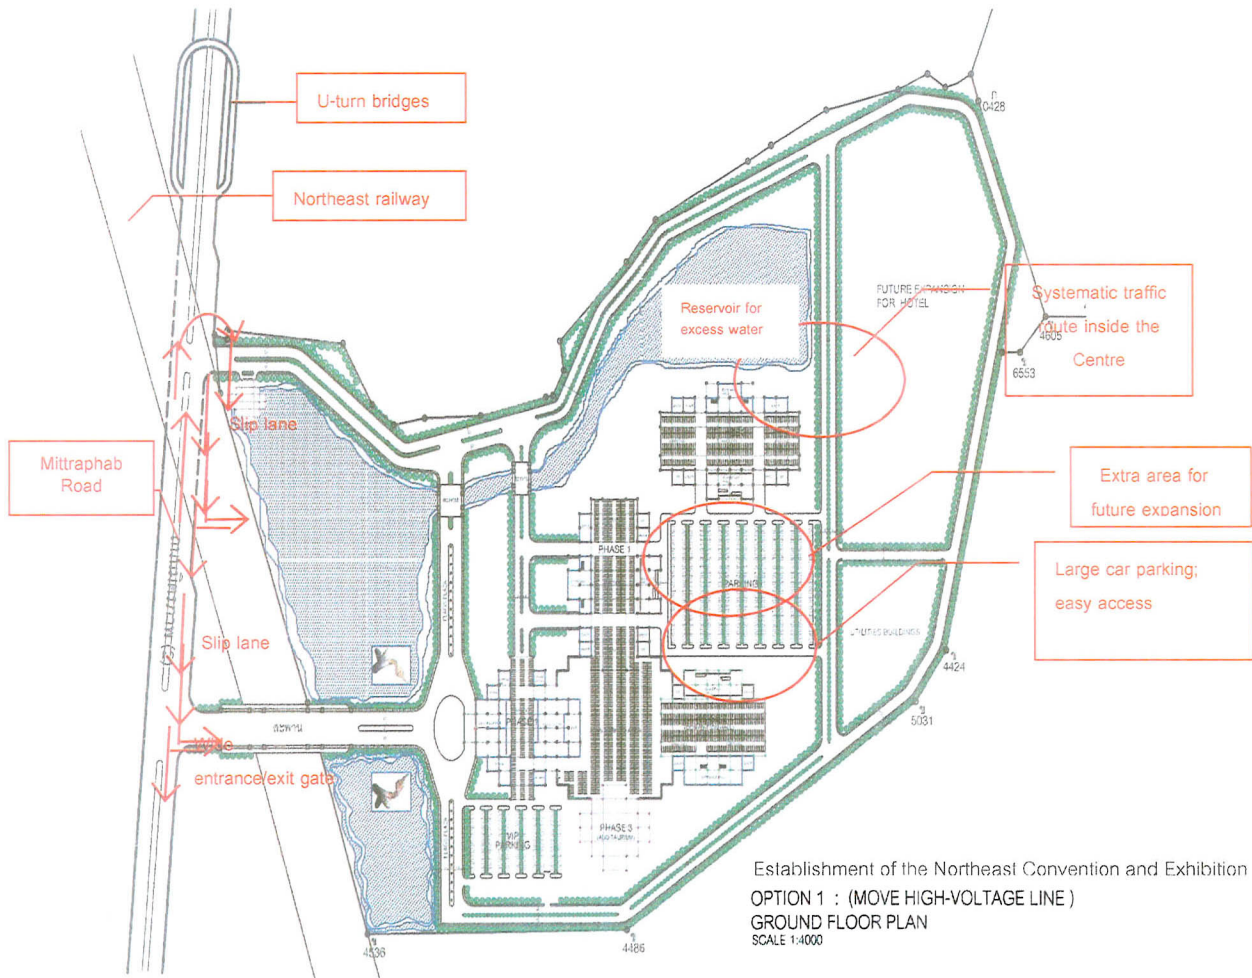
Ground floor plan of the Northeast Convention and Exhibition Centre
